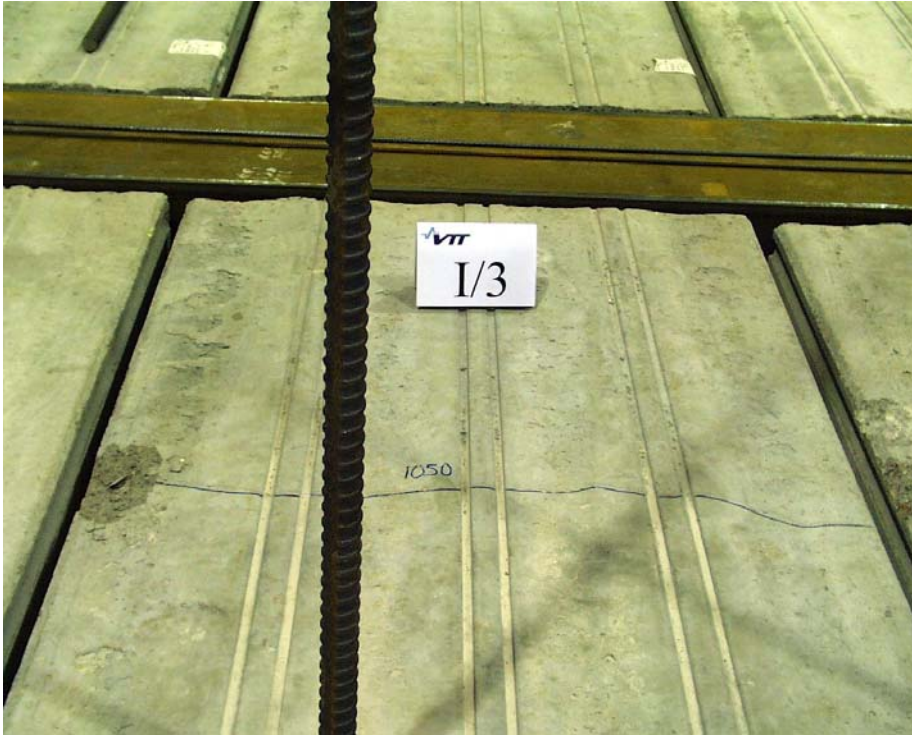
Initial bending crack in slab 3 at a distance of 1050 mm from slab end.
